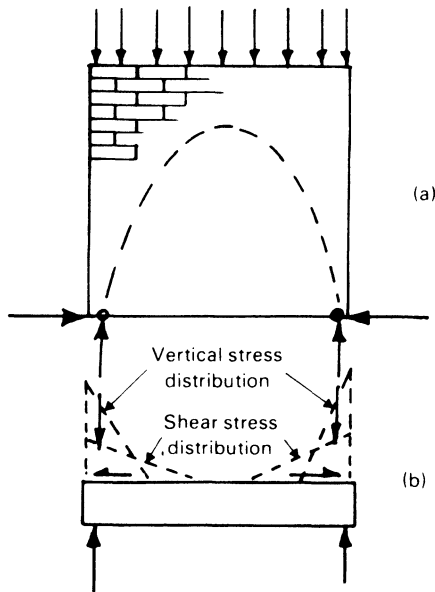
Structural action in composite wall-beam: (a) arching forces in wall; (b) vertical and shear forces in beam
